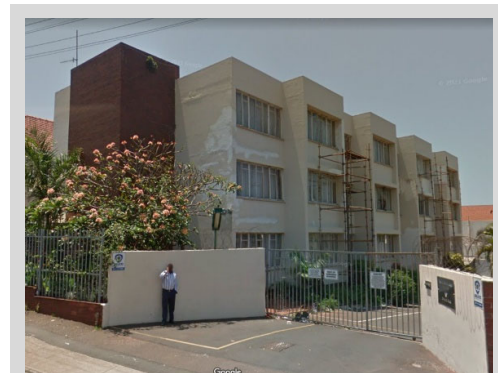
Kilwinning (23 Hunt Rd) – Streetview from 2017 indicating the primary elevation in a state much like when constructed, though under minor repairs for hairline cracks in the plaster. Source: (Google Street View, 2017(a))
